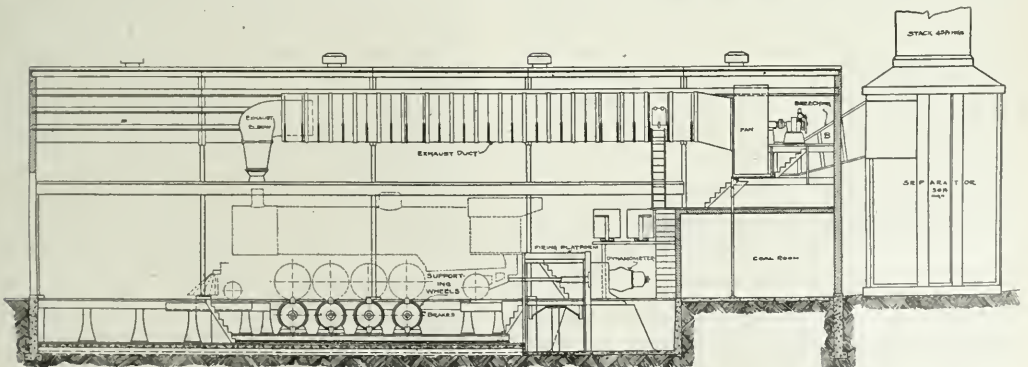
Longitudinal Section Through the Locomotive Testing Laboratory.
